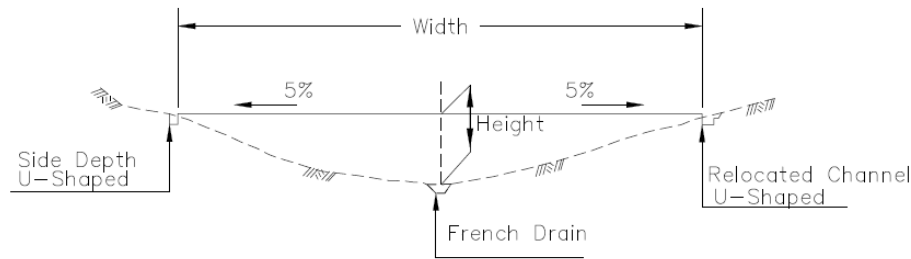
(c): Typical Arrangement for Spoil Banks: Cross Section of French Drain
